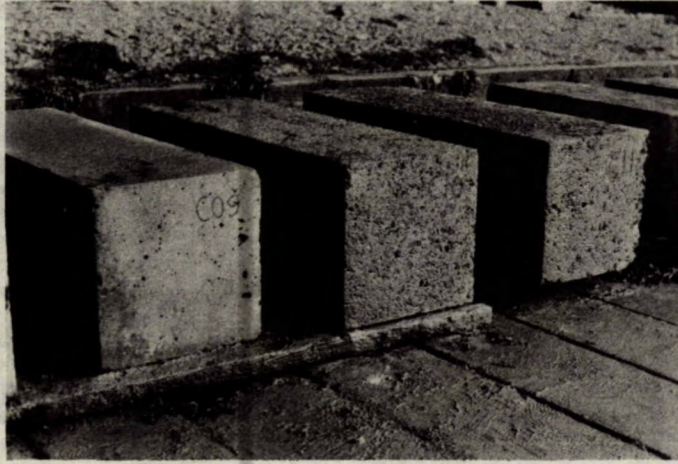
A view of the concrete specimens installed at Treat Island -
